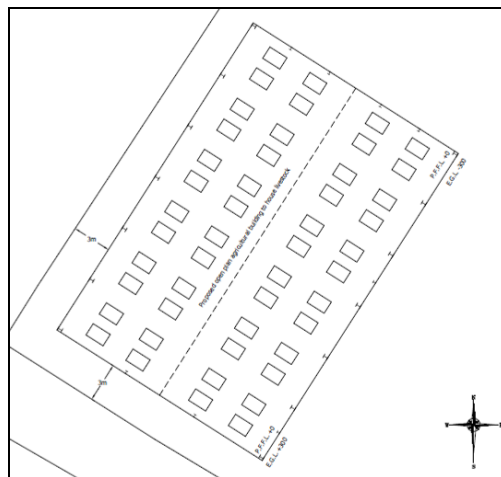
Plan of proposed building (from planning application: NP/DDD/1213/1071)
